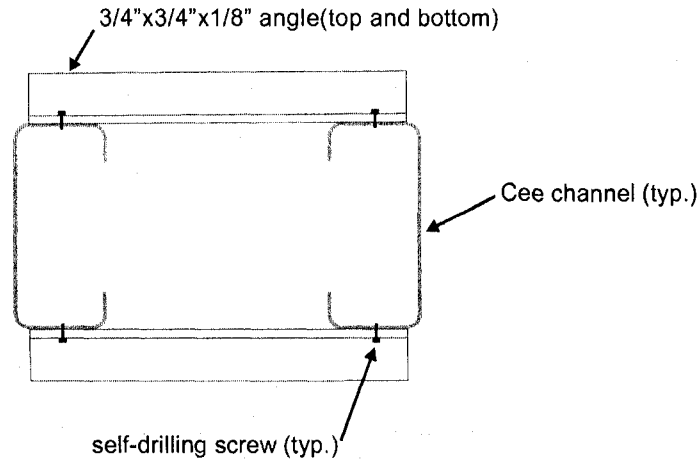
Cross section of beam specimen showing aluminum strap angles connected to C- flanges
